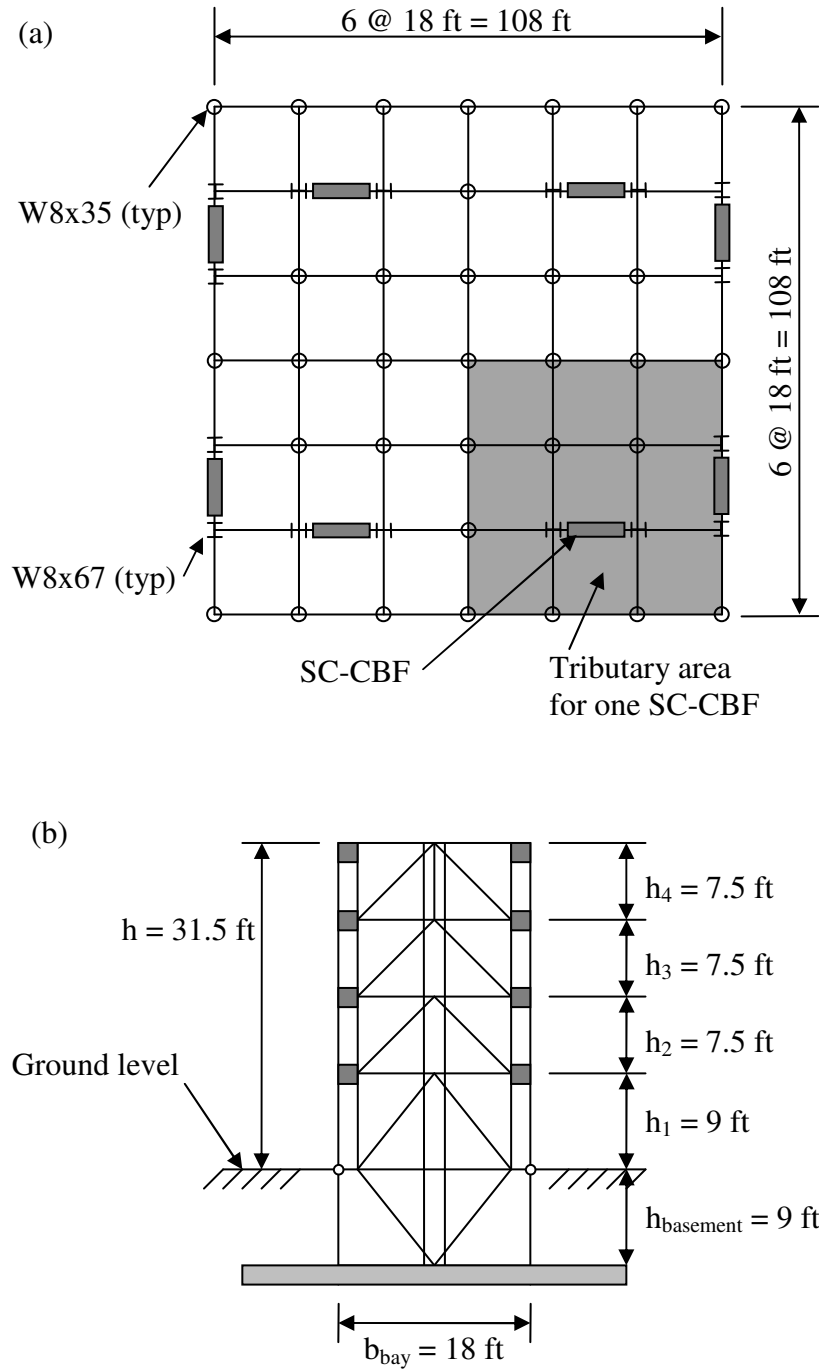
Prototype building: (a) floor plan; (b) elevation of SC-CBF
